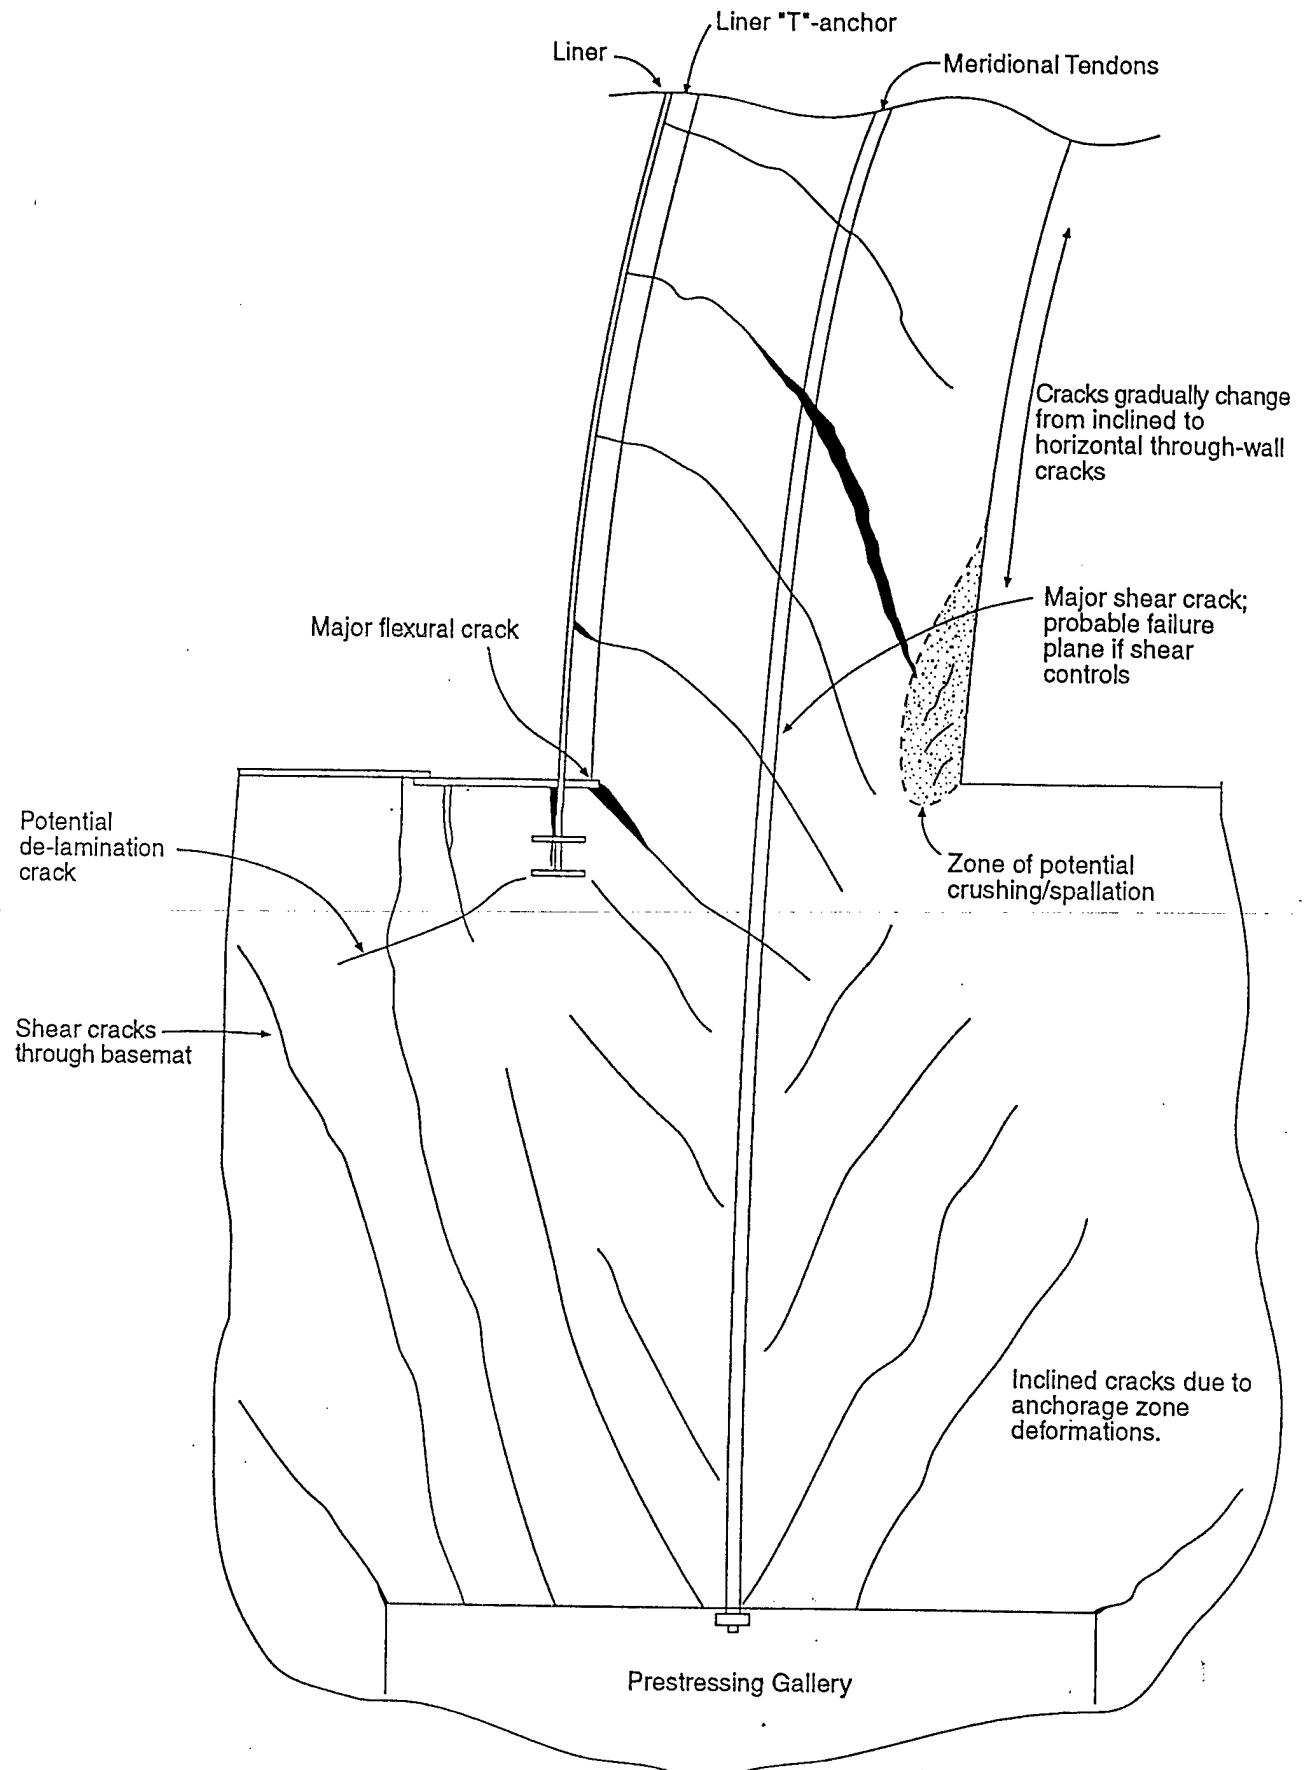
Deformed Shape and Crack Patterns of Wall-Base Juncture Region
